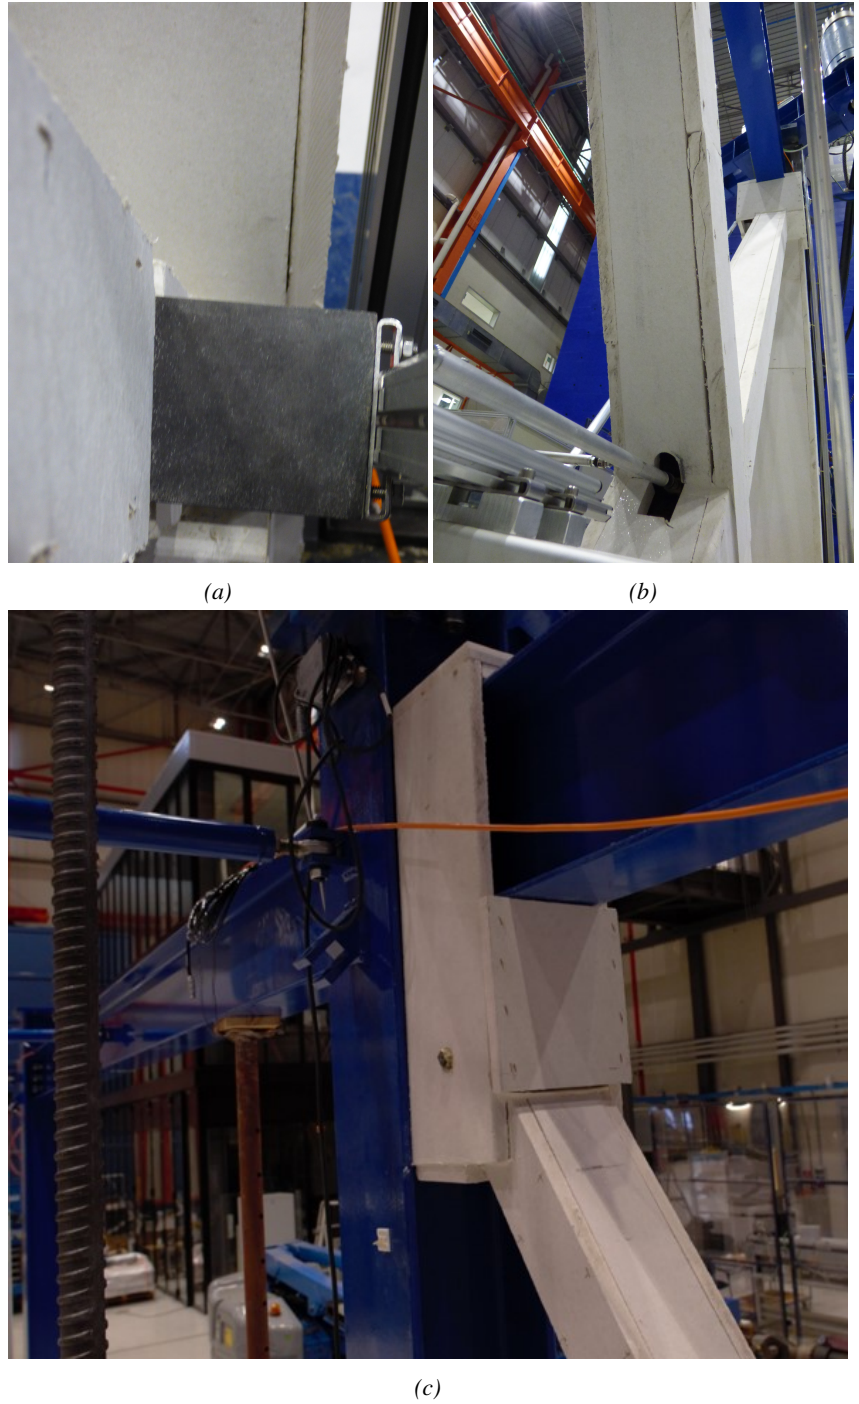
Damages after two seismic tests at 1.0g: a) damage of the casing of the column; b) detachment of the boards at the bracing crossing; c) damage of the casing of the bottom connection.
